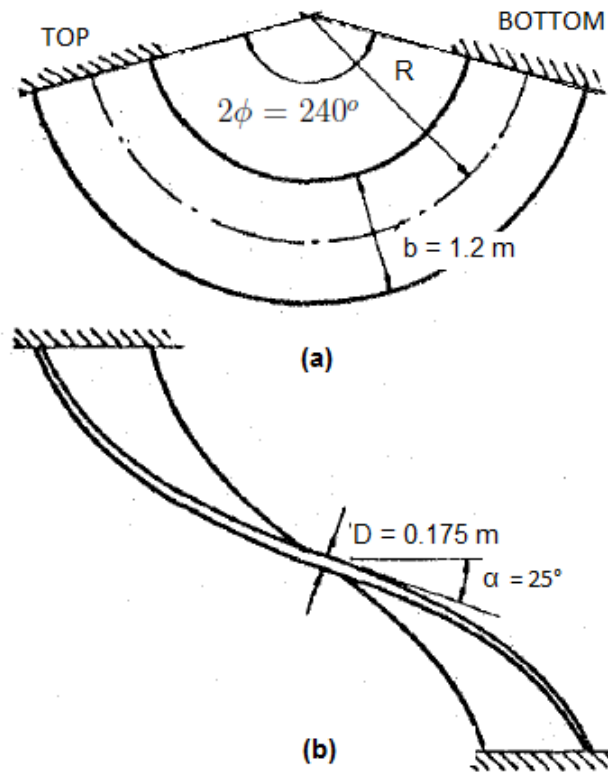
Geometry of Helicoidal Stair:(a) Plan (b) Elevation
